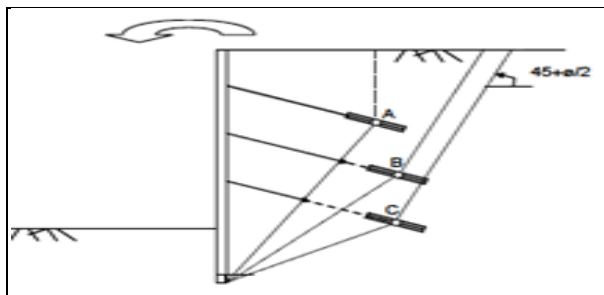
Overall instability failures due to low anchor length [67, 68]
